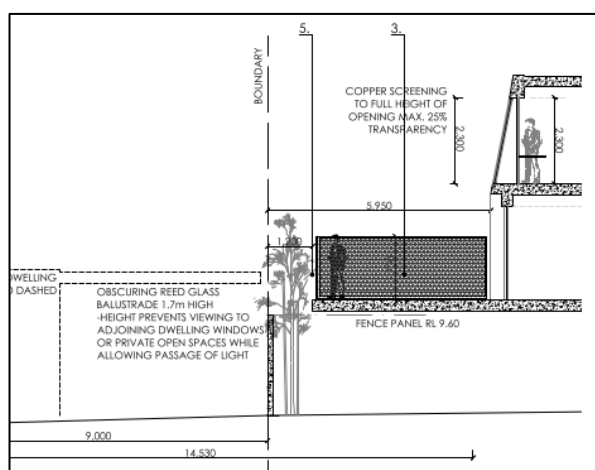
Screening section showing landscaping buffer to No 165 Cubitt Street
